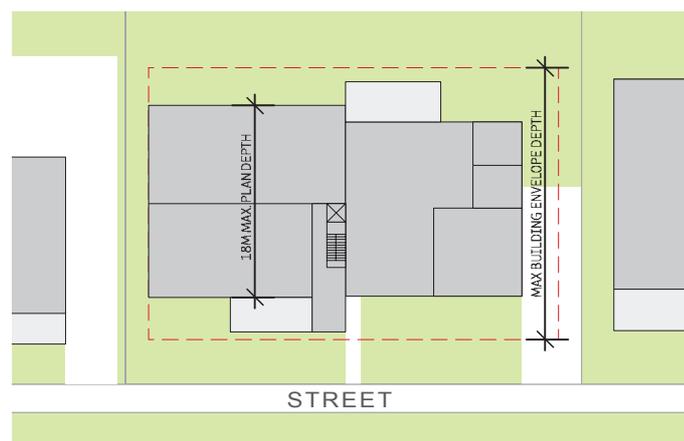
DIAGRAM 4: PLAN DEPTH TO BE NO GREATER THAN 18M GLASS LINE-TO-GLASS LINE IN RESIDENTIAL BUILDINGS STREET
